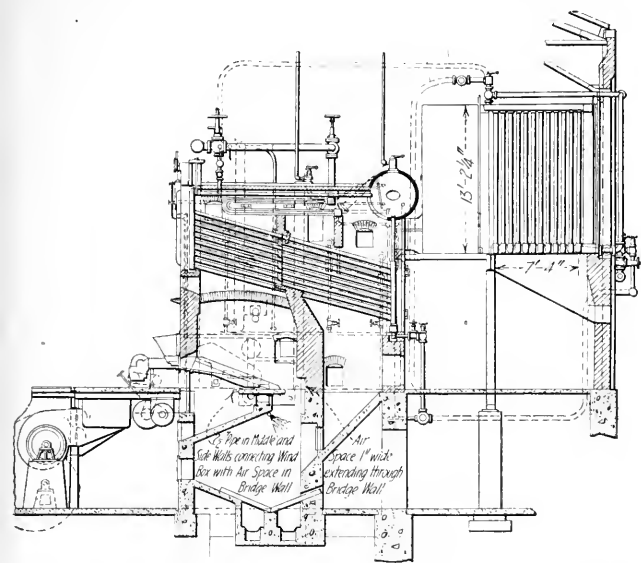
ECONOMIZERS ARRANGED TO BE ACCESSIBLE FROM OUTDOORS
